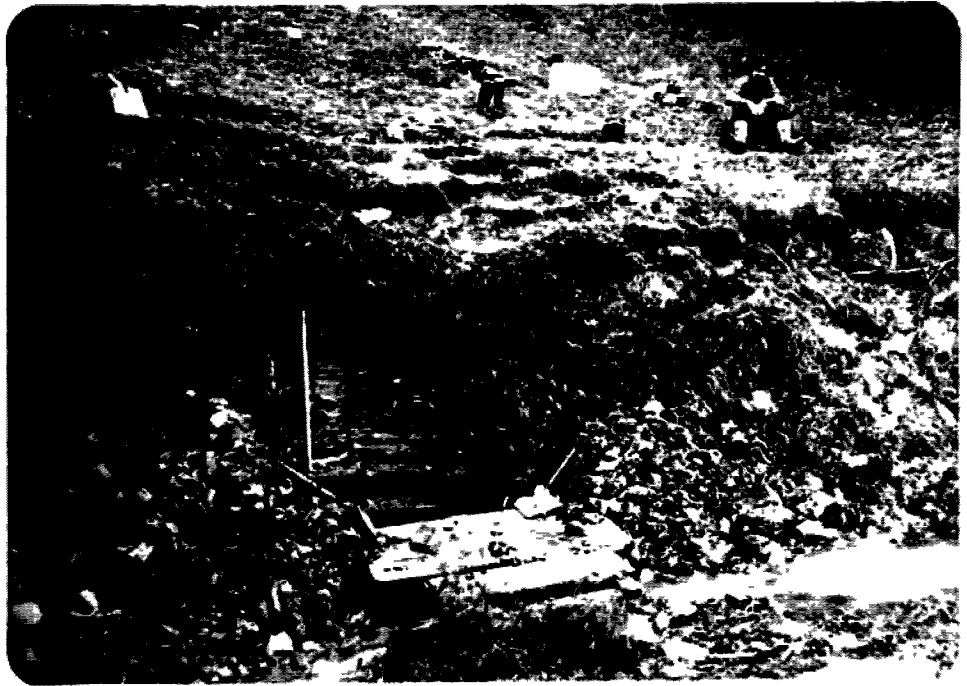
Excavation at Site No. 4, Templeton East.
